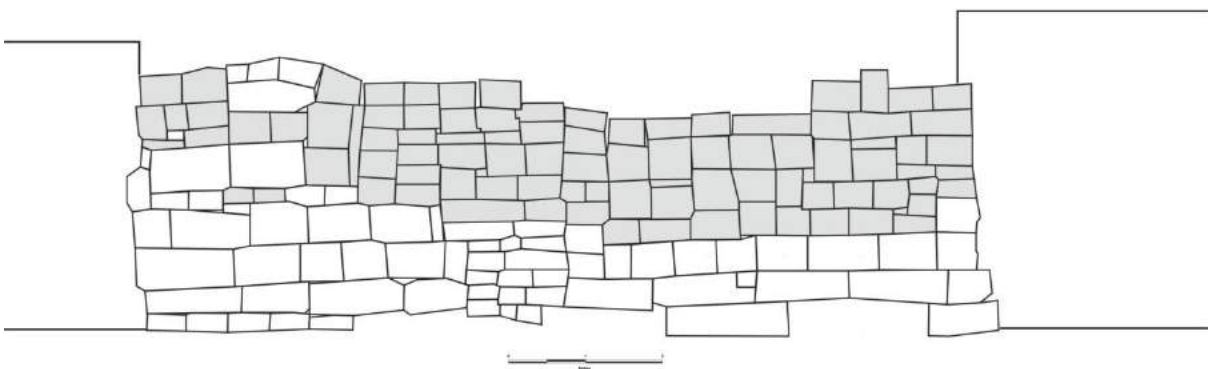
Photo and masonry pattern of the West gateway on the North wall – sandstone (grey), laterite (white)
